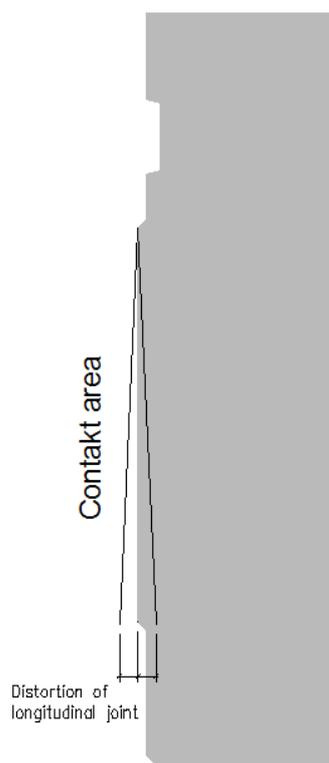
Manufacturing tolerances on manufactured segment of one-pass constructions – Installation tolerances
